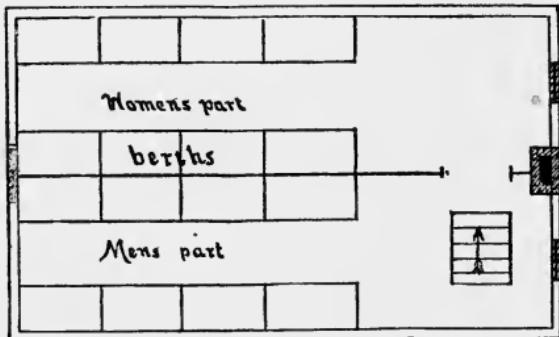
UPPER FLOOR OF BOG-HOUSE.
